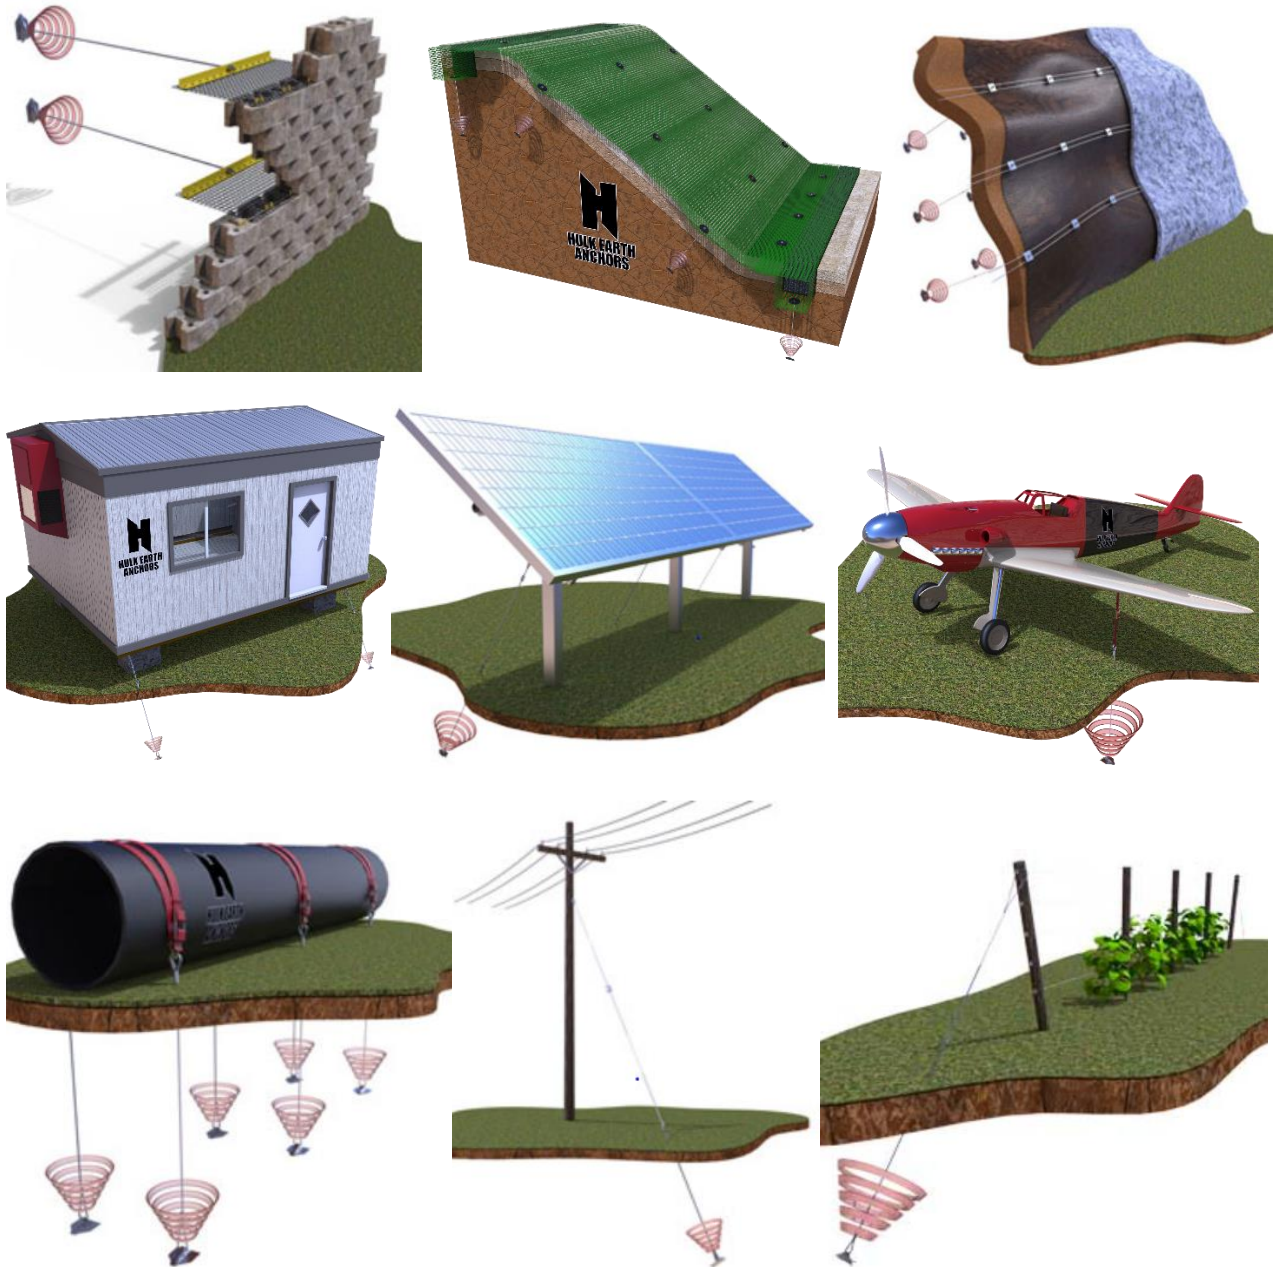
Application examples of flip anchors (Anchoring Rope And Rigging Pty. Ltd, 2021).
